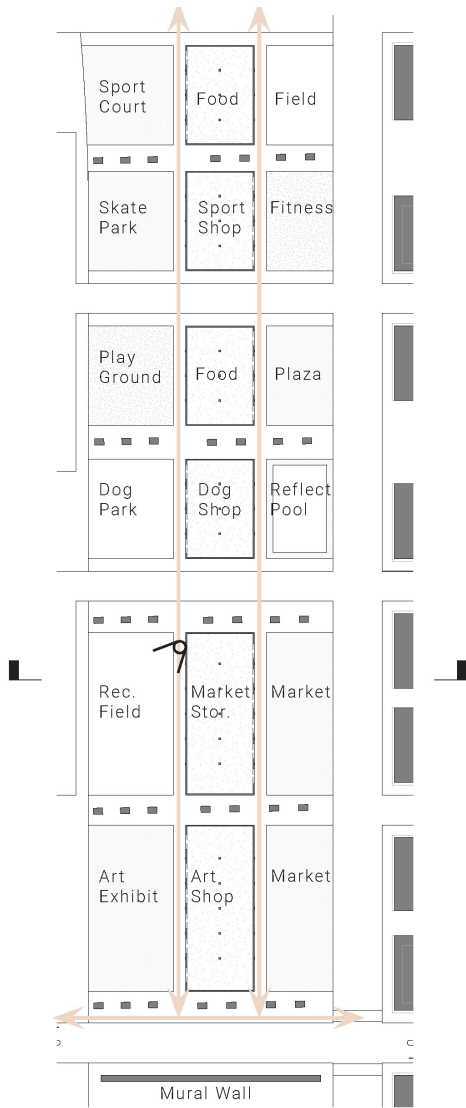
, Underpass - Enlarged Plan – 395 (Source: Drawn by Author)
